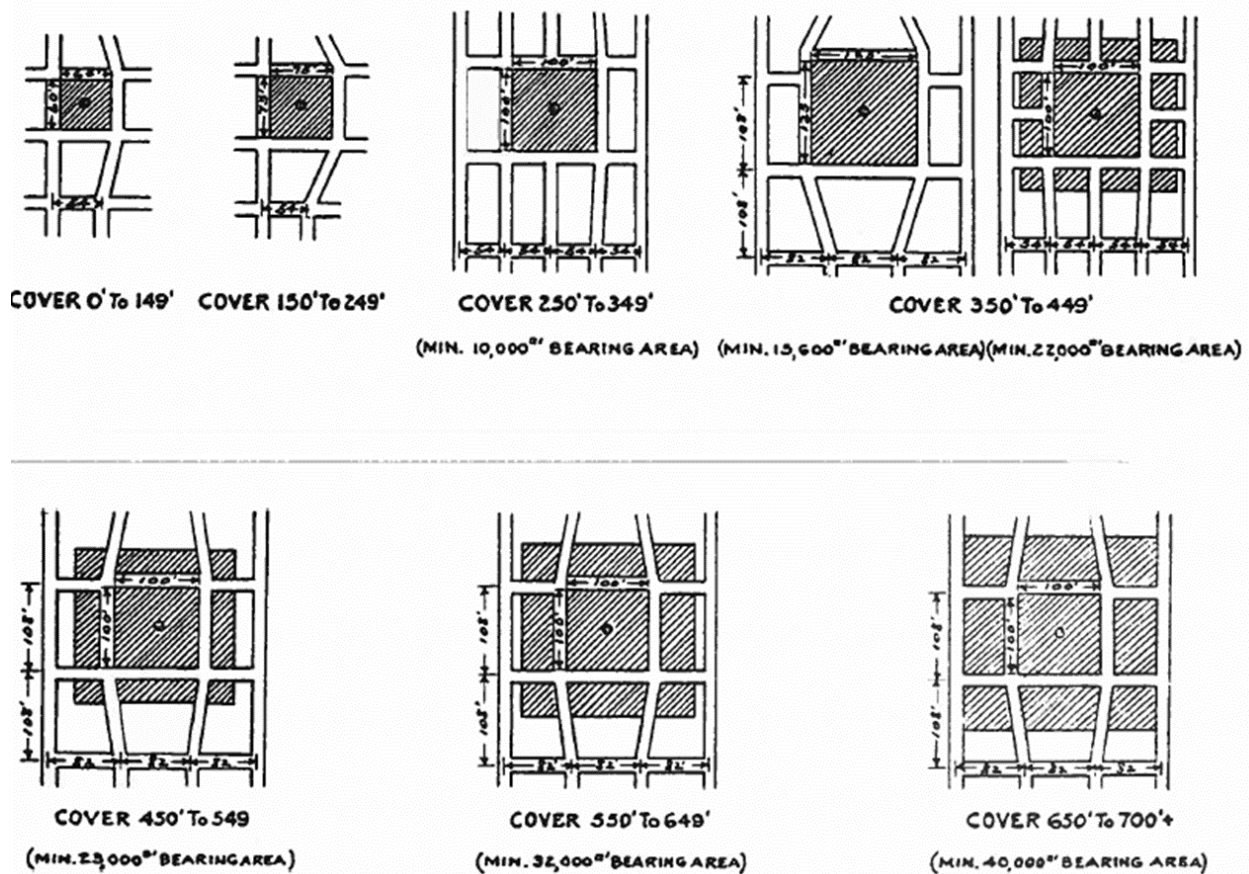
Examples of pillar plans from the 1957 Study.
